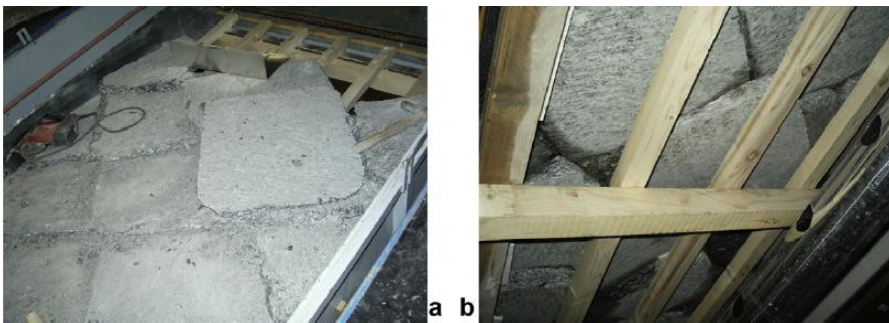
View of the specimen of a traditional stone roof carried out by Fasana and Nelva (a) front side of the specimen and (b) back side of the same specimen [106].
